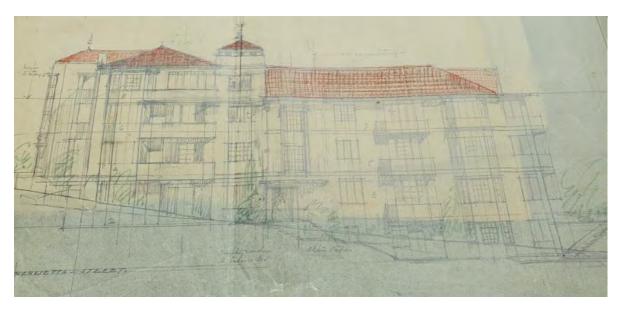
design for Windermere flats at the corner of Henrietta Street and New South Head Road, Double Bay in 1938 (Source: State Library of NSW, PXD 351, Roll No.294, ff 2954-80)
